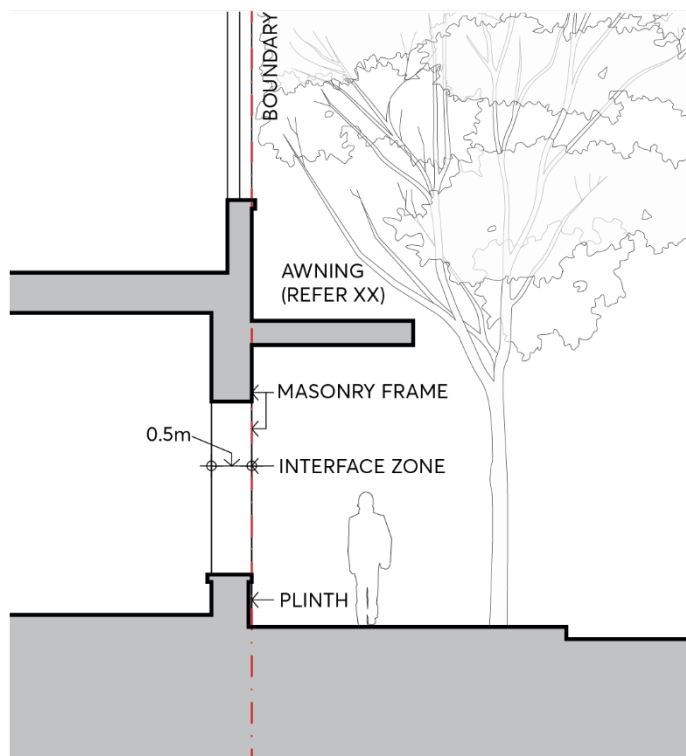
Active Ground Floor Frontage
